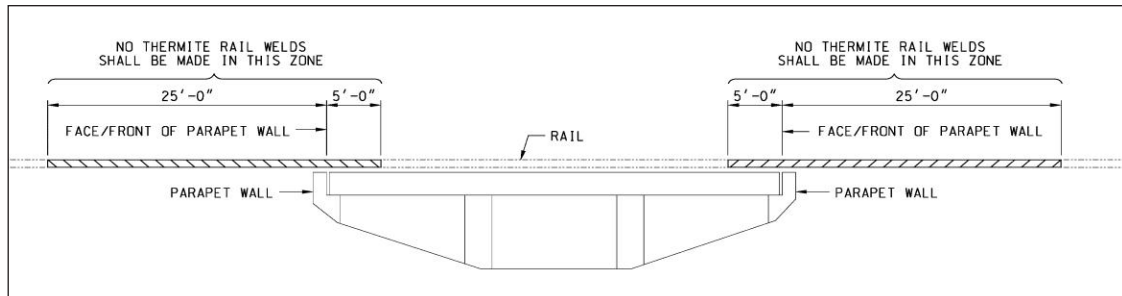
CWR Rail Welding Near Bridge Ends
